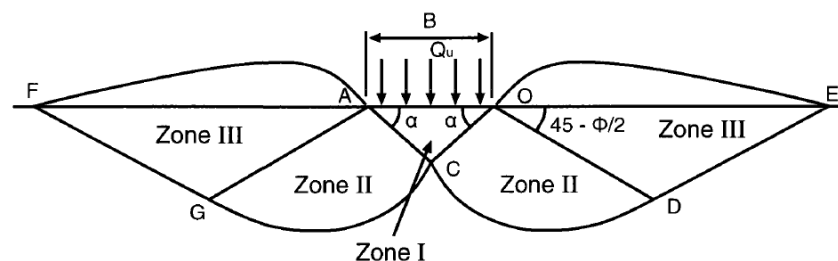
Bearing capacity failure of soil under strip foundation[1]
